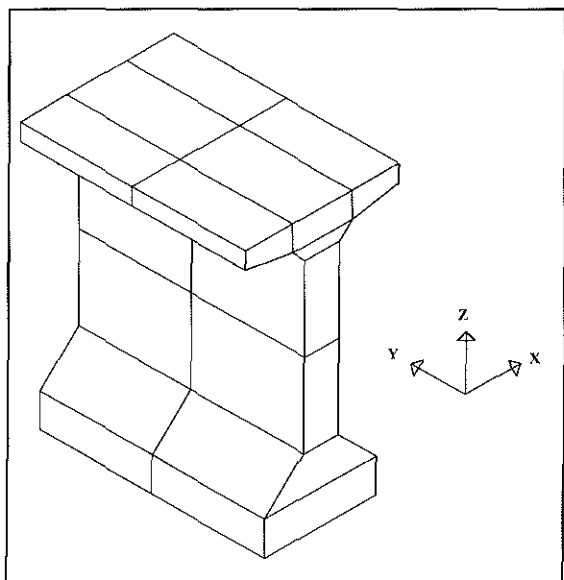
Solid Element Model of the Modified AASHTO Type IV Girder.
